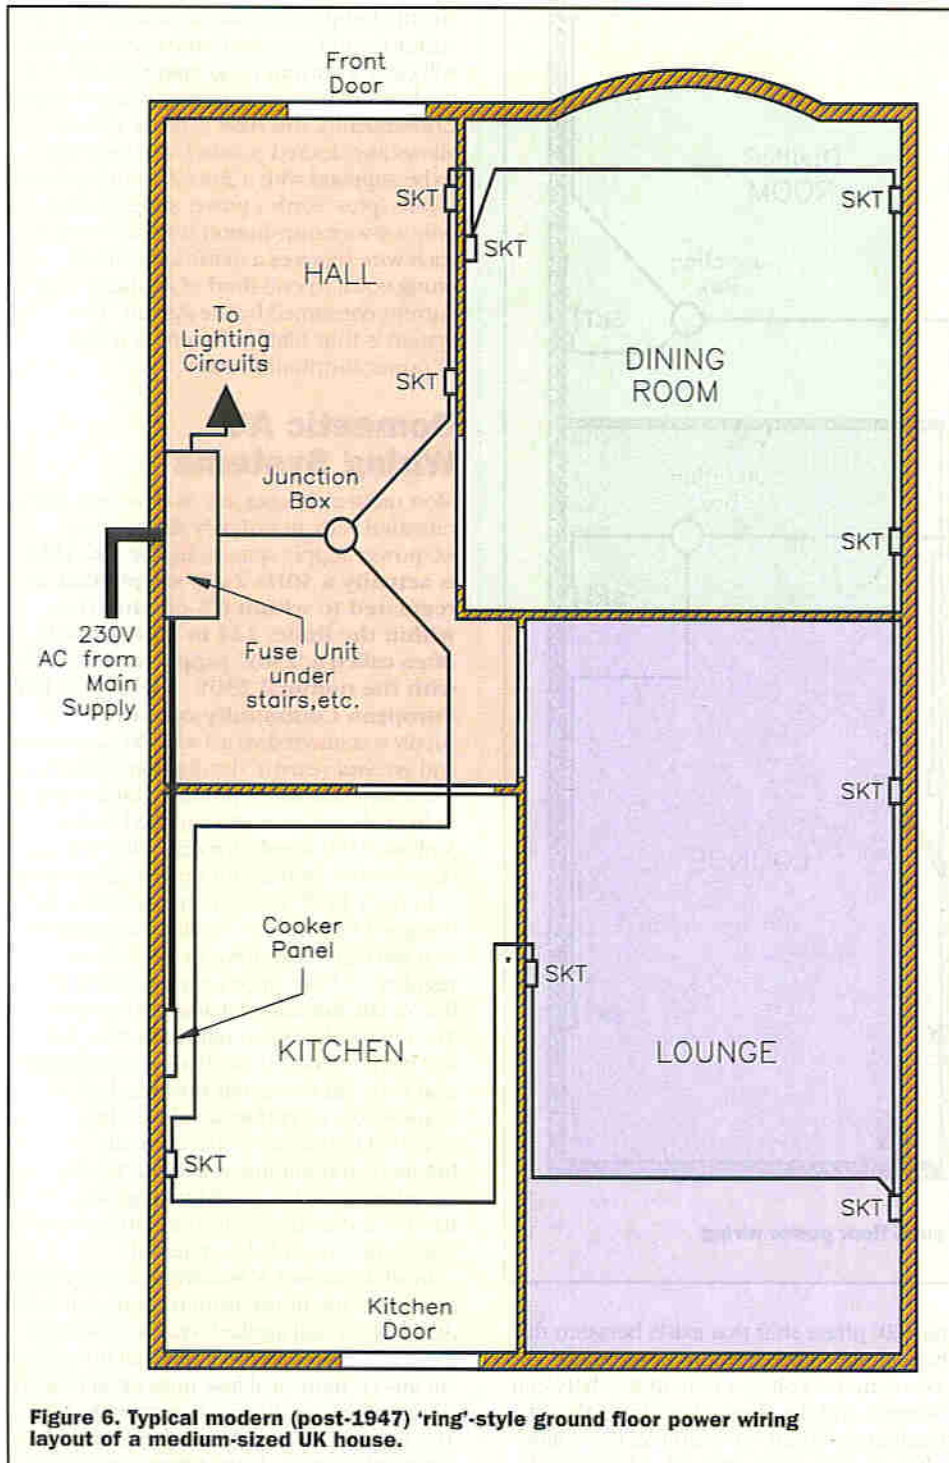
Typical modern (post-1947) 'ring'-style ground floor power wiring layout of a medium-sized UK house.
